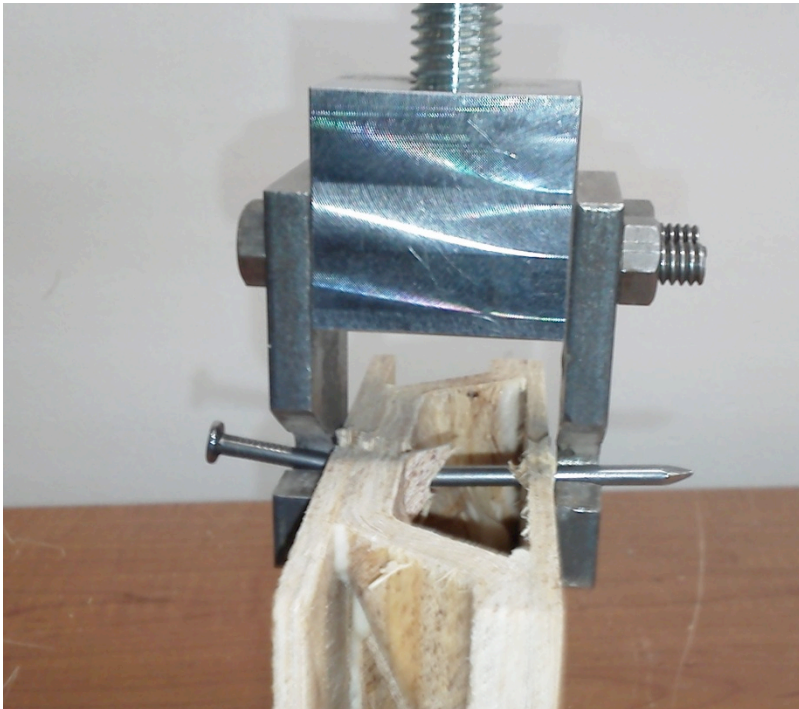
Nail head being pulled through thick panel skin by a custom loading fixture.
